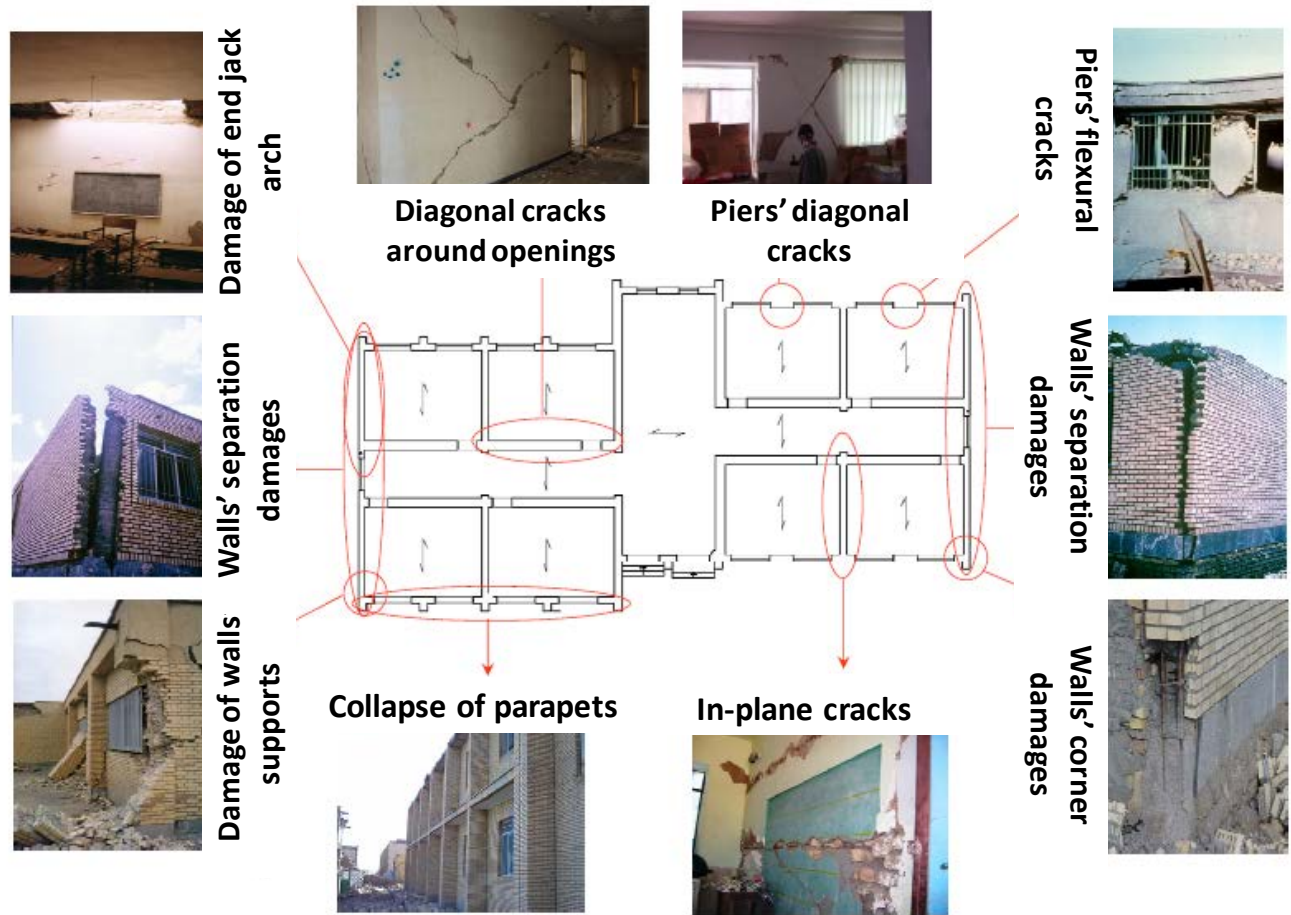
Failure modes in Iranian masonry school buildings [2]
